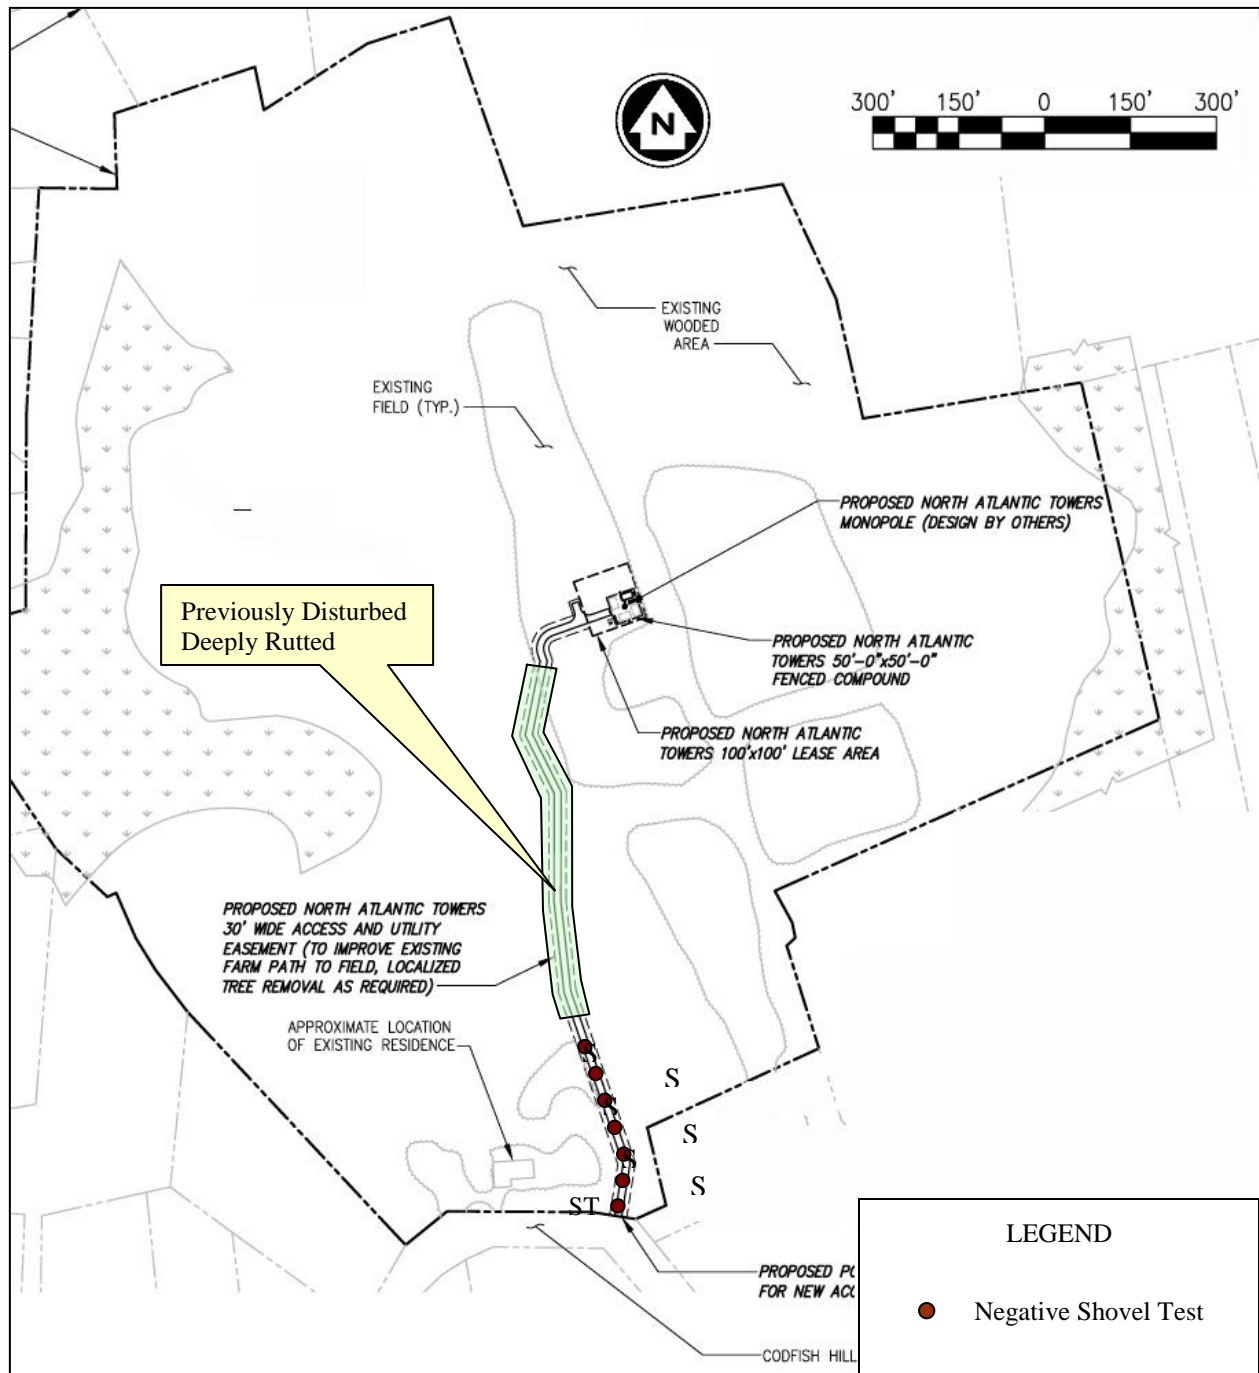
Plan view of proposed lease area and access road associated with Alternate X (locations of shovel tests excavated along the access road and previously disturbed areas noted on plan view).
